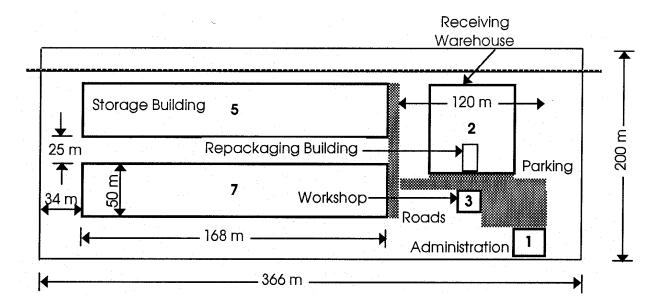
Site Layout of the Building Storage Facility — Uranium Metal, 25% Case
